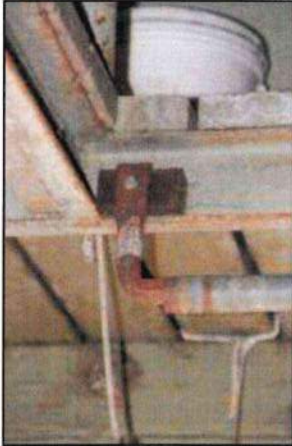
Fire Station #1 Steel structural members of the stairways show significant rust.
